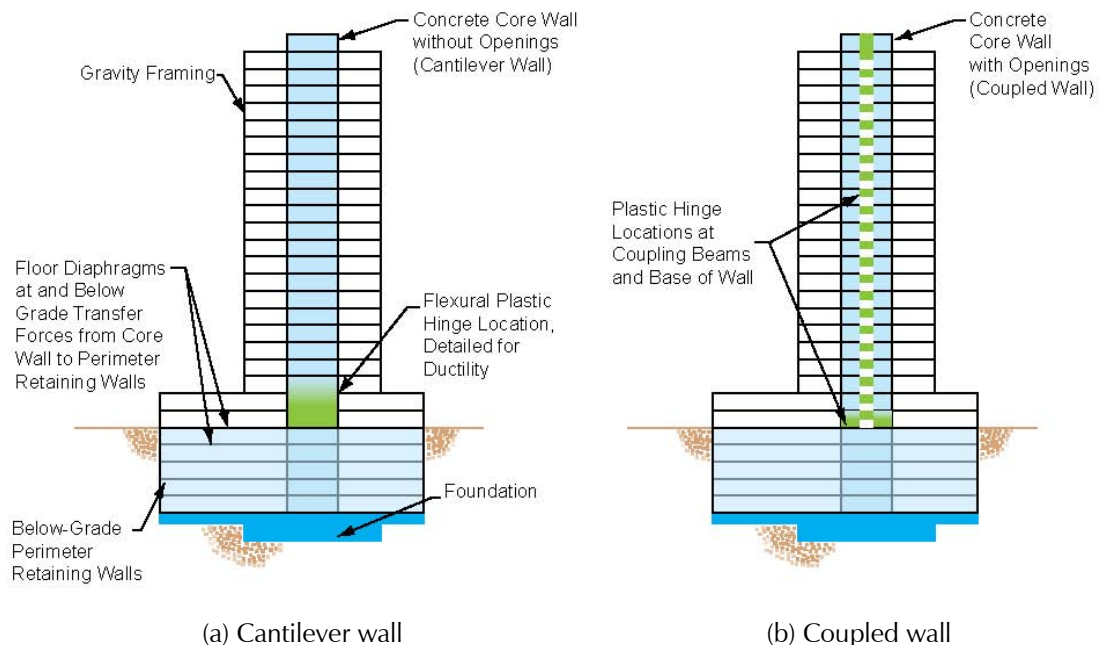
Desirable nonlinear mechanisms for: (a) cantilever wall; and (b) coupled wall.
